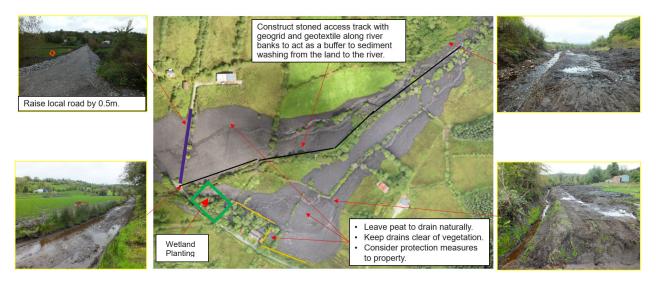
Proposed Works at Corcormick East of the Local Road
